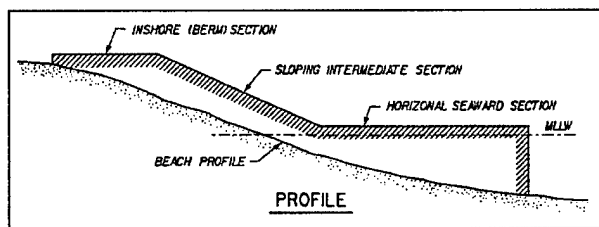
Typical groin profile showing inshore (berm) section, sloping intermediate section, and horizontal seaward section
